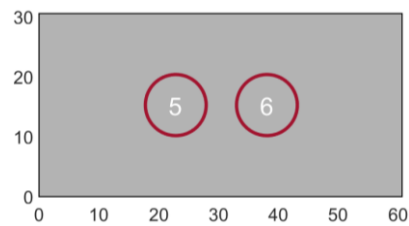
Core locations for the alkali-boosted bidirectionally reinforced concrete specimen (cm).
